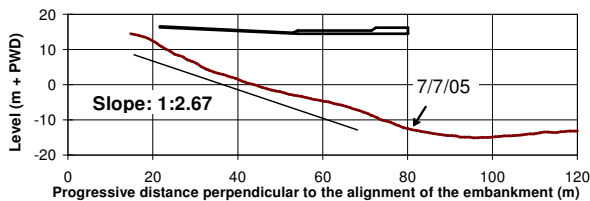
Typical damaged falling apron with concrete blocks measured at Ghutail FAP 21/22⁸⁾
